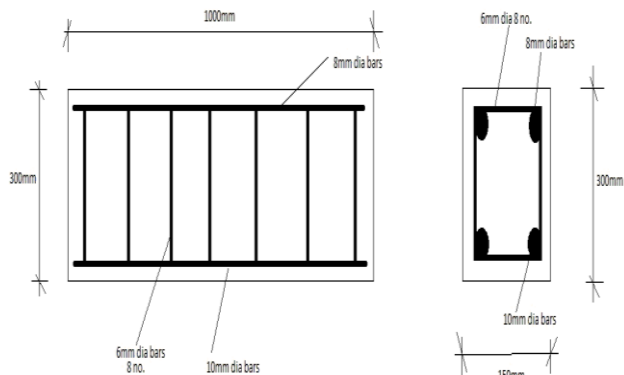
Beam Detailing (150mm x 300mm x 1000mm)
